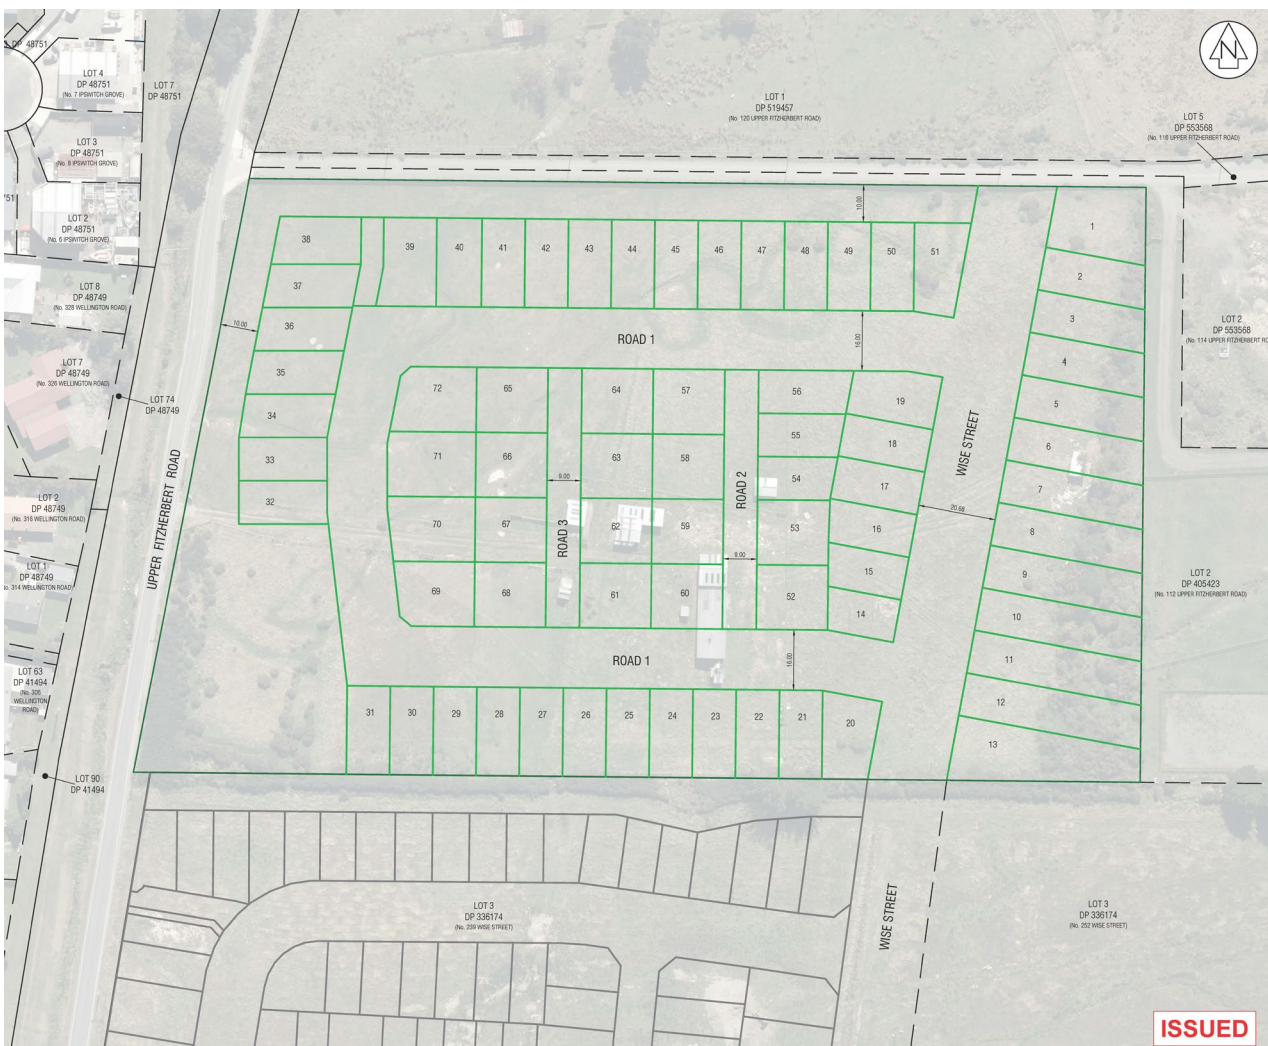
Indicative subdivision scheme plan. Source: Cuttriss
